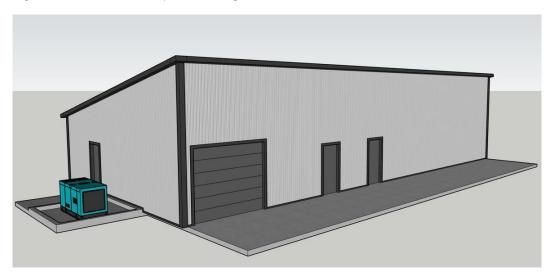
General depiction of the water treatment plant to be located at McNab Road site
